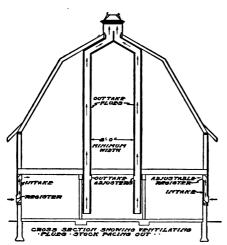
Outtake flues for King ventilating system when animals face out.
